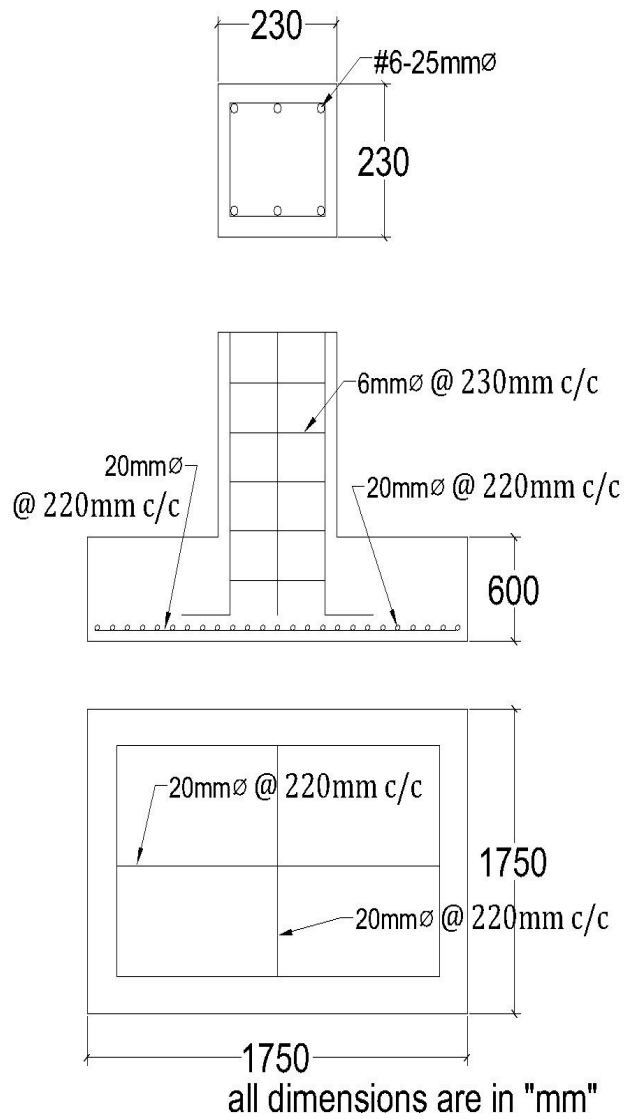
REINFORCEMENT DETAIL OF FOOTING
